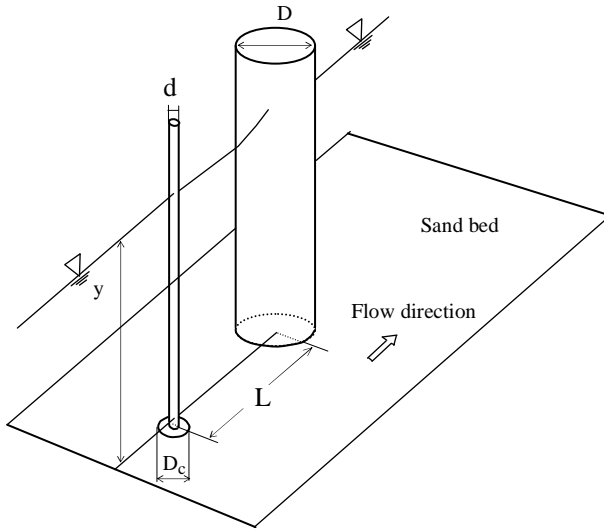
Definition sketch of sacrificial pile-collar arrangement at the upstream of the pier
